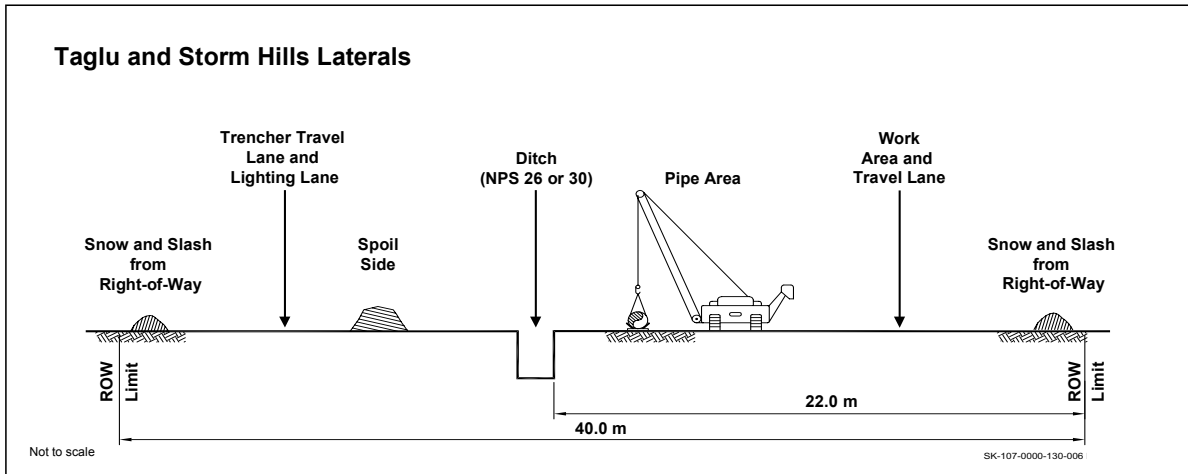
Typical Right-of-Way Layout for NPS 26 or 30 Pipe
